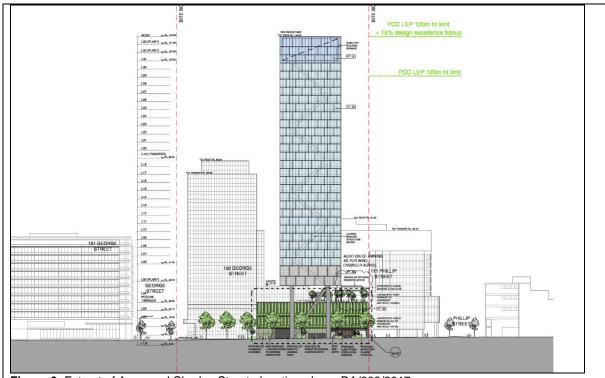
Extract of Approved Charles Street elevation plan - DA/808/2017
